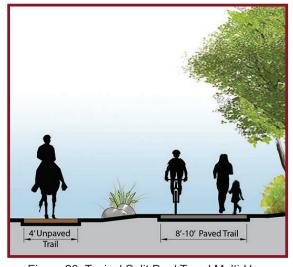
Typical Split Dual Tread Multi-Use Trail Cross Section
